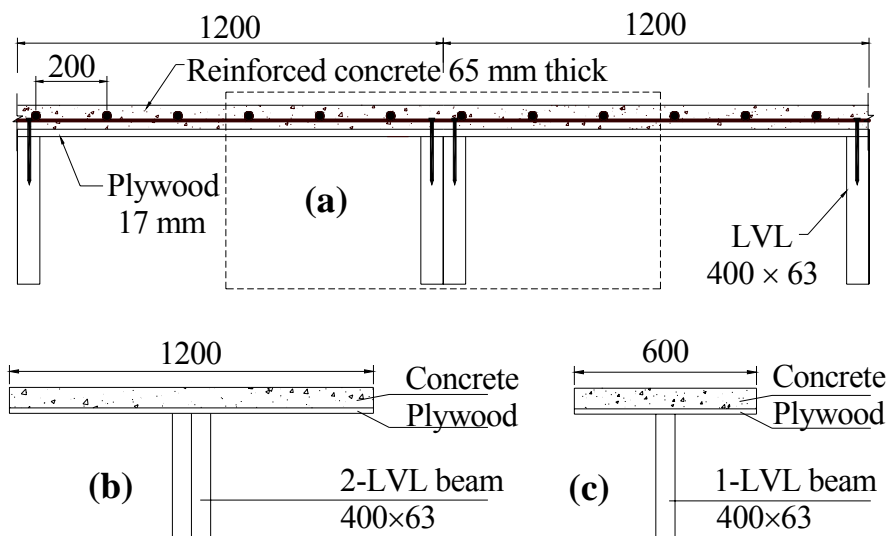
(a) Semi-prefabricated “M” section panel; (b) Reduced T-section; (c) Further reduced T-section (dimensions in mm)
